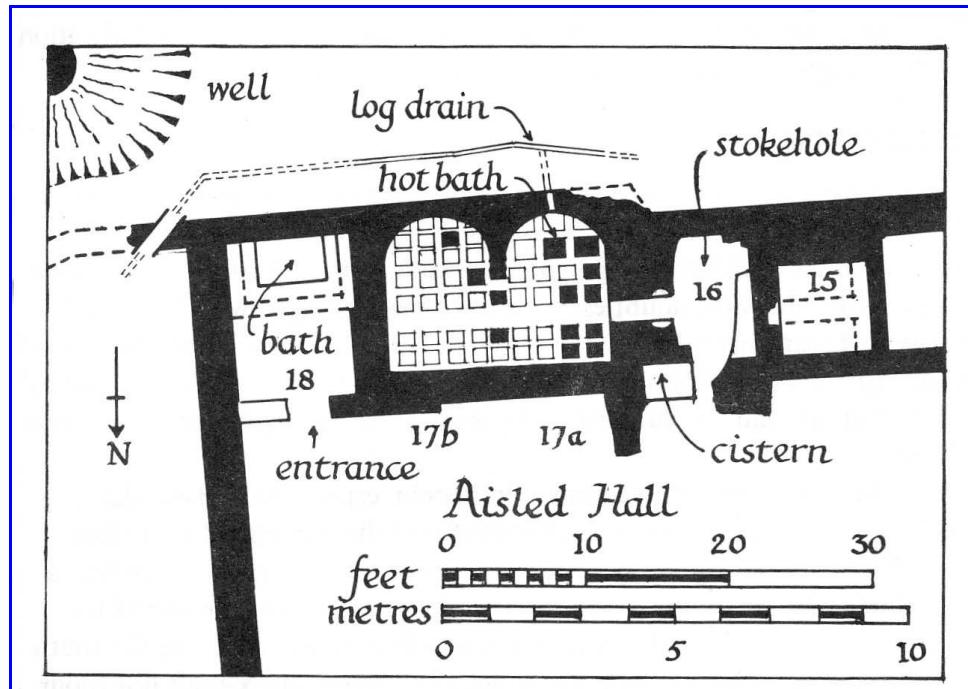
Detailed Plan of the Bath House at Sparsholt (Johnston, 1972)
